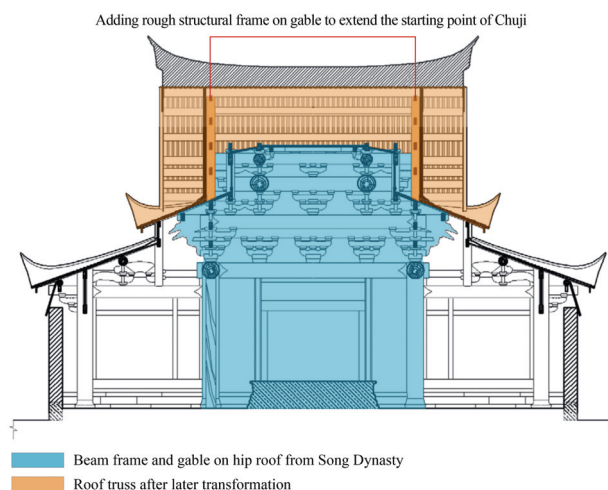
The frame of hip-gable roof in the main hall of the Chen Taiwei Palace. Drawing by authors and the base plan cited from (Ruan 2016, p. 234).
